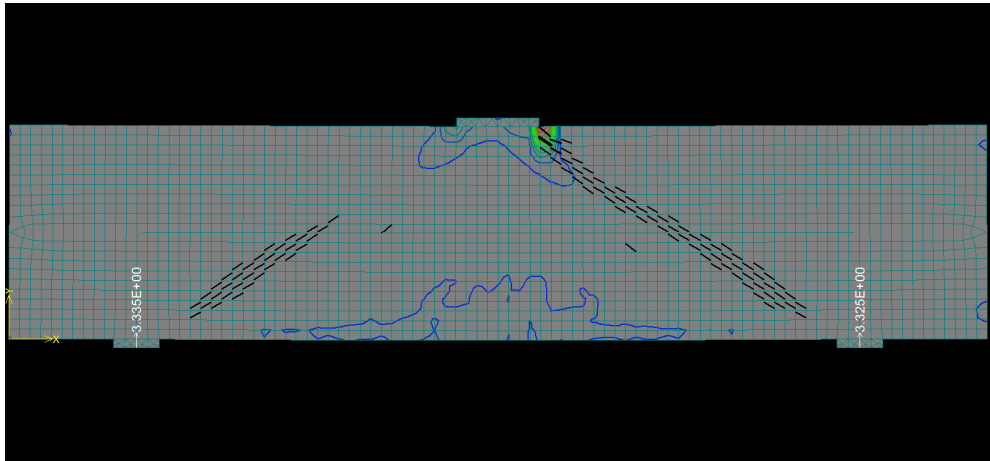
Crack pattern (after crack filtering with a minimum crack width = 0.031 in.) at failure of the computer model of the beam IV 2175-1.85-03 of Birrcher's tests
